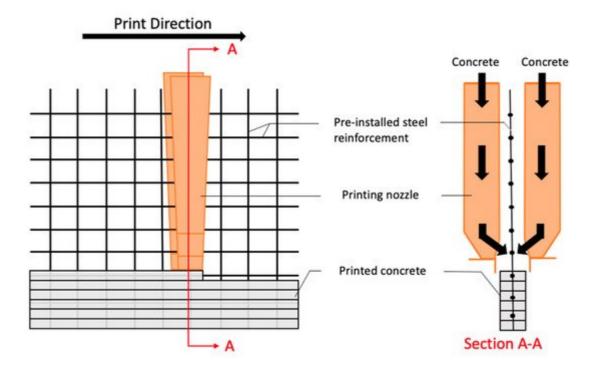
Concrete printing with vertical and horizontal reinforcement by HuaShang Tengda Ltd.
